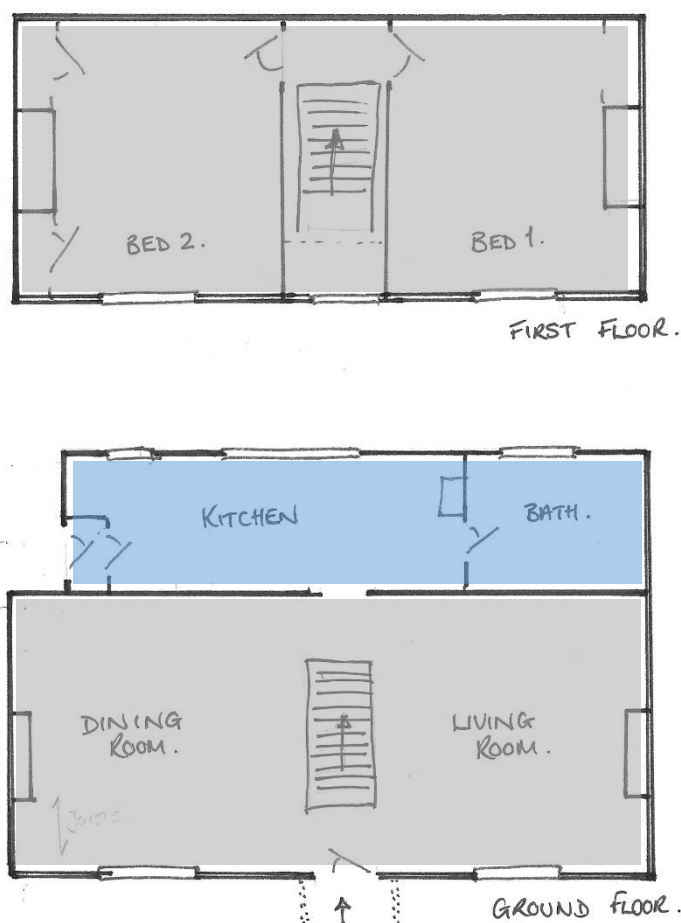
not to scale floor plans. Grey shows the original 1825 cottage, and the blue is the 1950s extension
